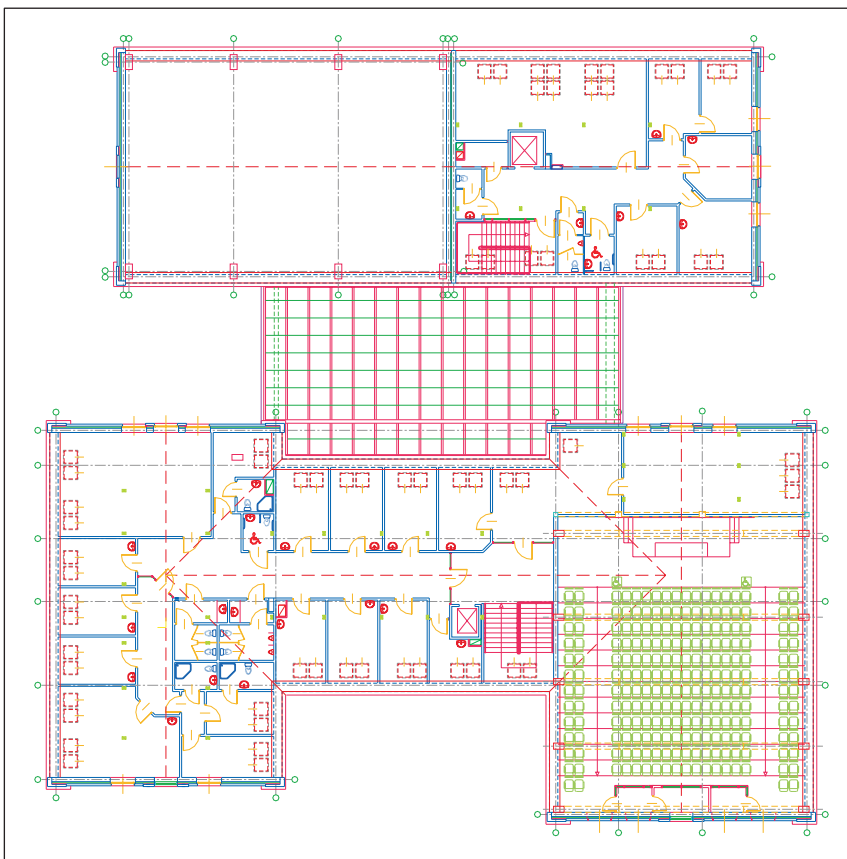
The attic floor plan. Author: M. ZAGROBA
